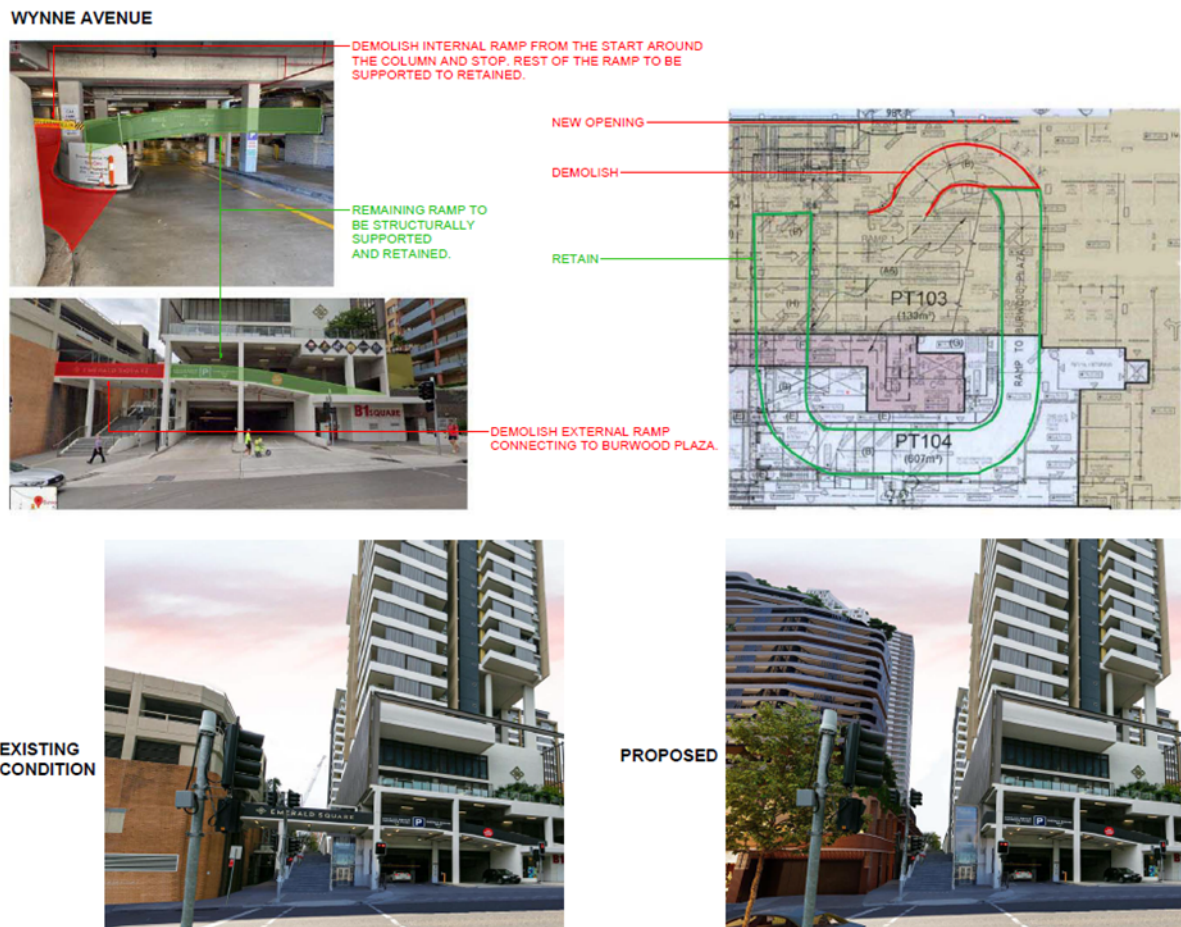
Extract of Wynne Avenue (Retain and Demolition) Plan AR-DA-2117
